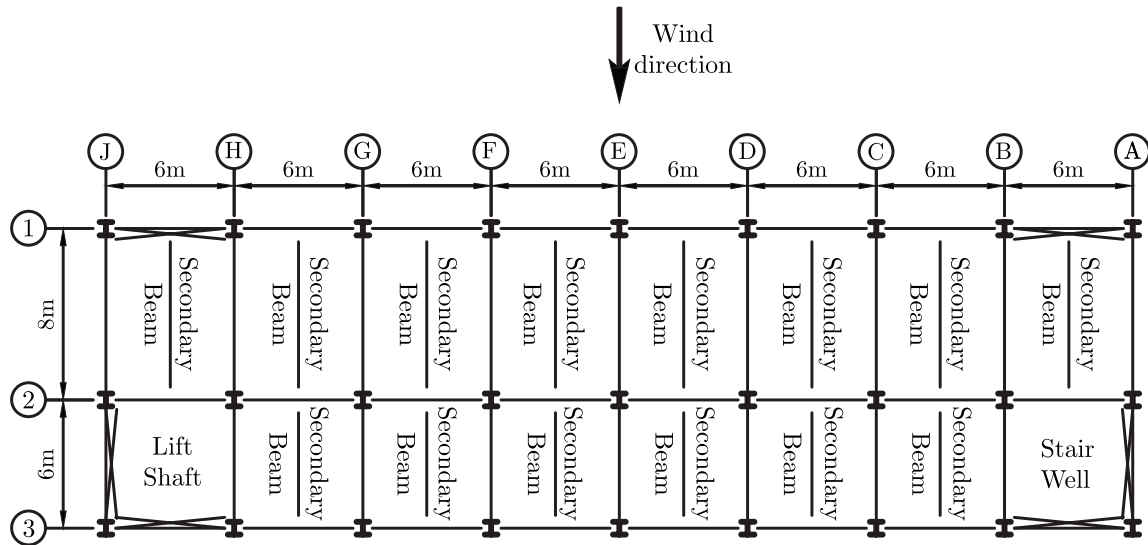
Plan of a typical small office building, after Brettle & Brown (2009)
